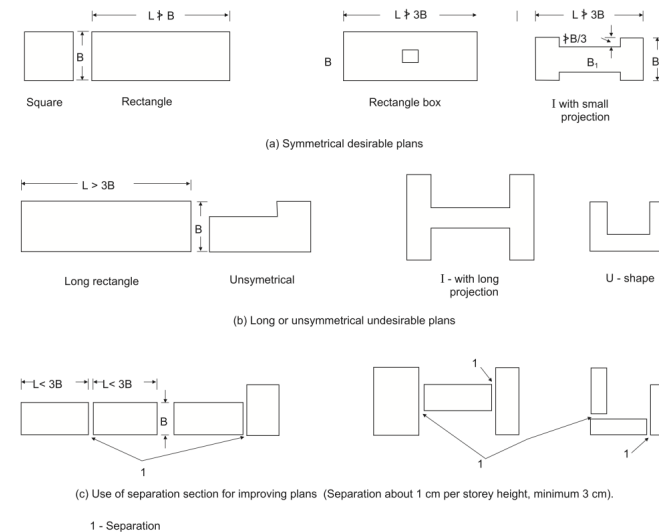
; Plan of building blocks (Kaikan, 2004, pp. Ch. 3, p.4)
